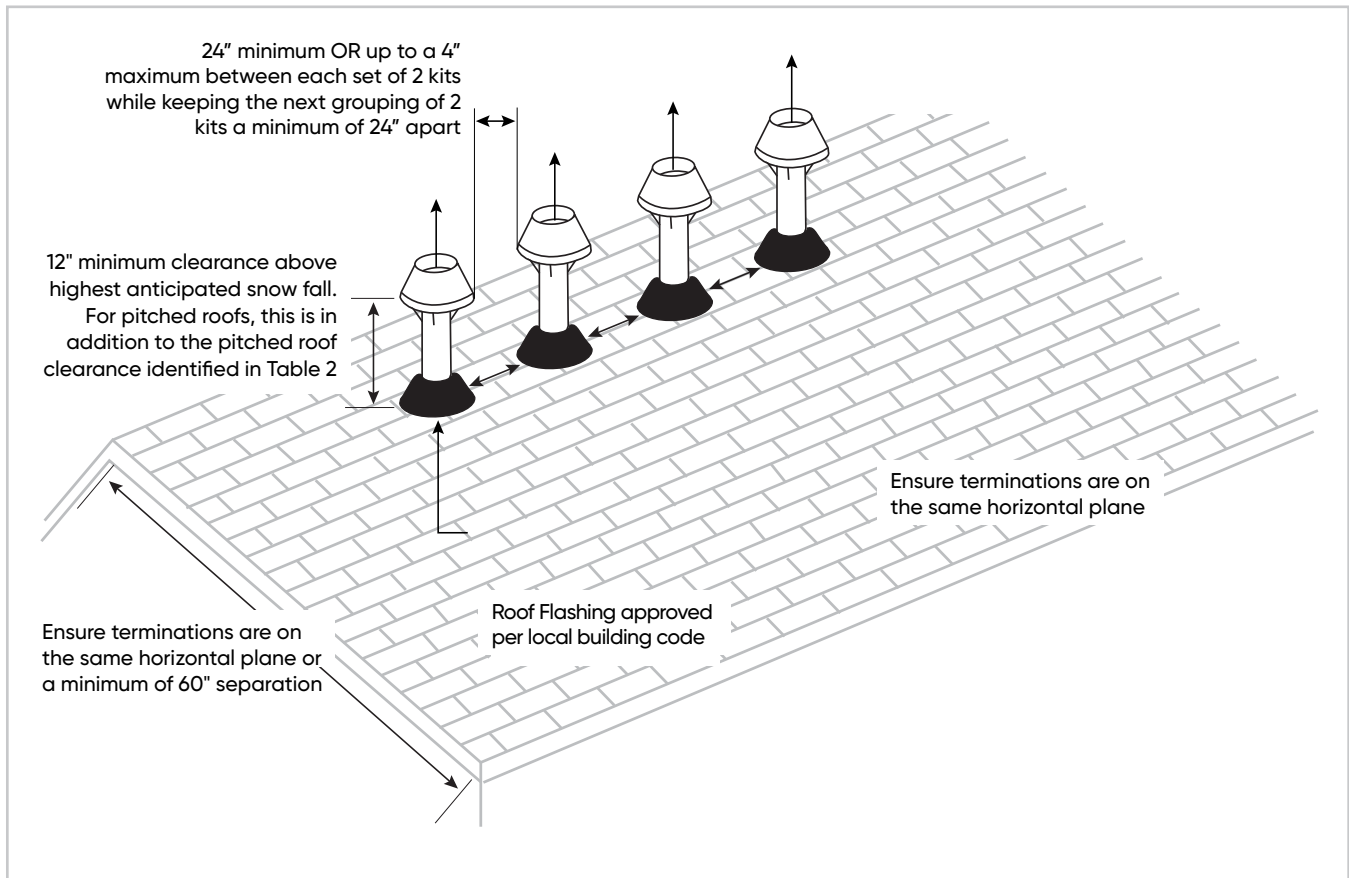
Typical Multiple Concentric Vent Roof Terminations
